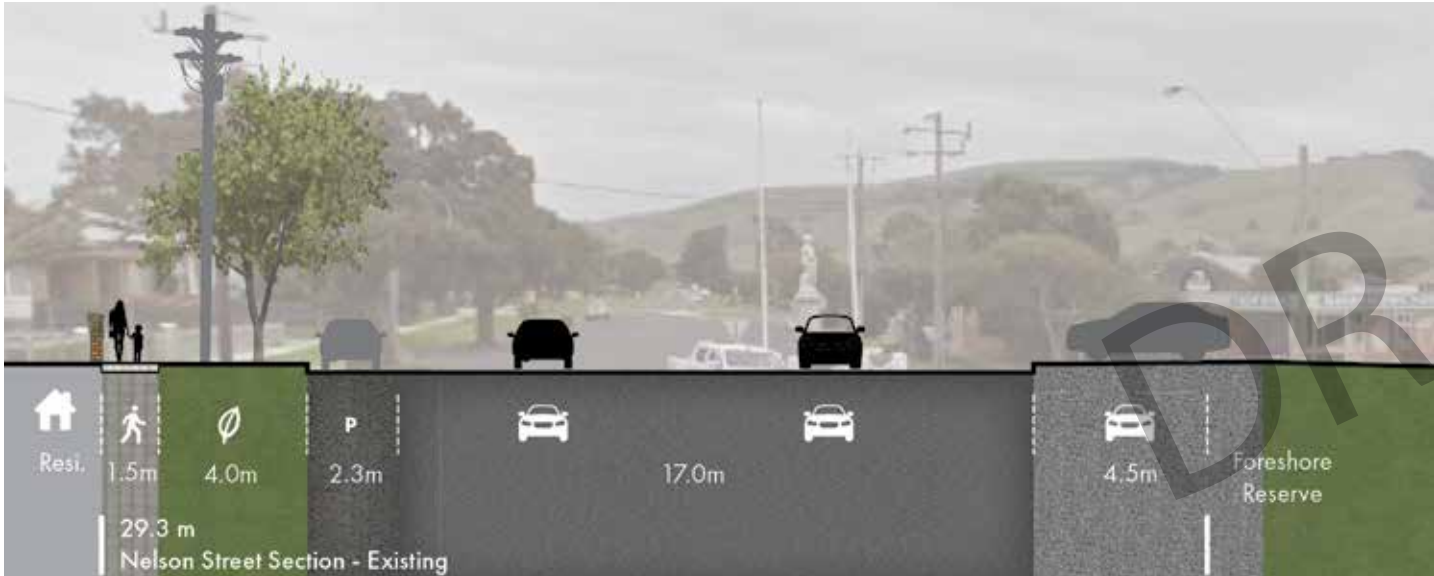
Great Ocean Road (Nelson Street to Nelson Street) A-A'- Existing Cross Section
